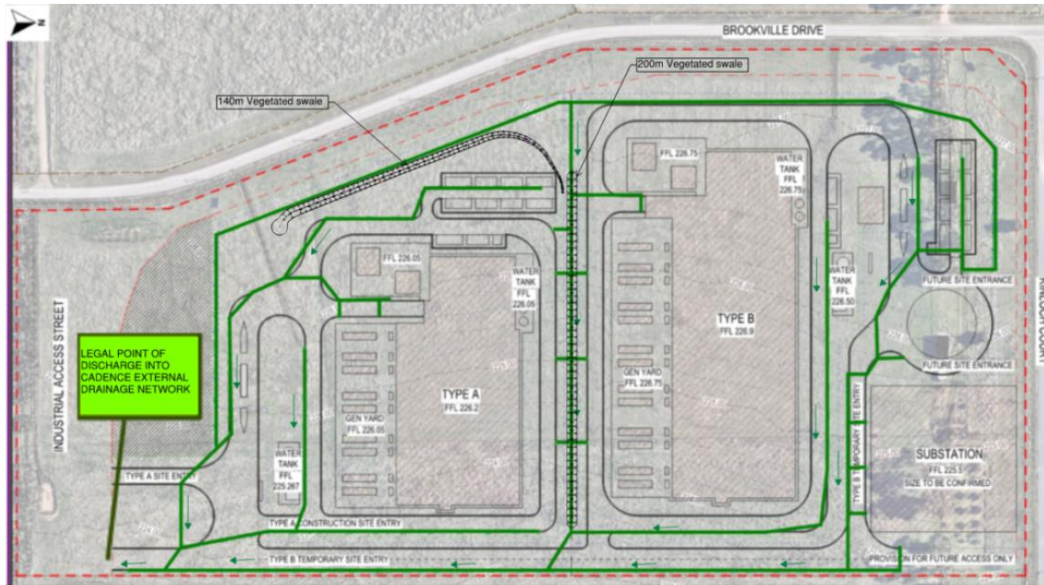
Proposed stormwater site layout (Source: Stormwater Management Strategy)
